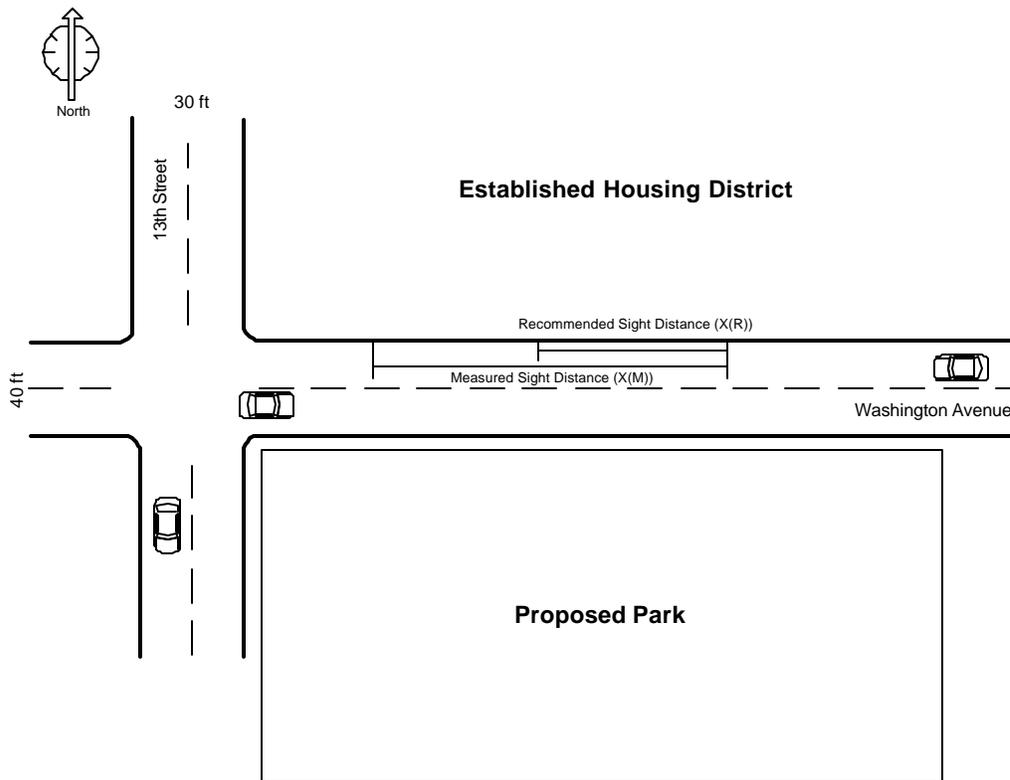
Washington Avenue and 13th Street Stopping Sight Distance
